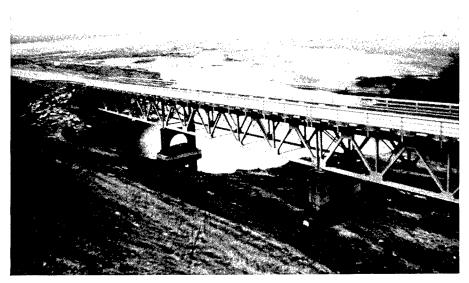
Scour hole formed at breached terminus of levee and U.S. Highway 159 bridge embankment, causing failure of approach embankment. View from top of railroad embankment, near Rulo, Nebraska.
